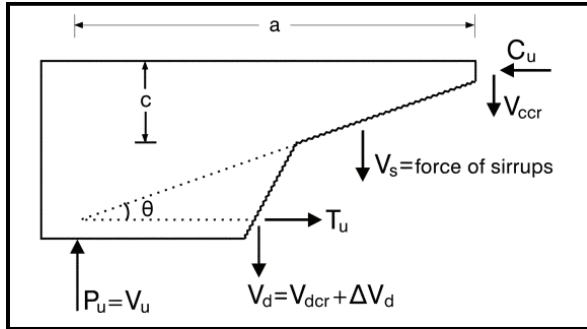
Forces on portion of beam with stirrups above critical diagonal crack at failure.
